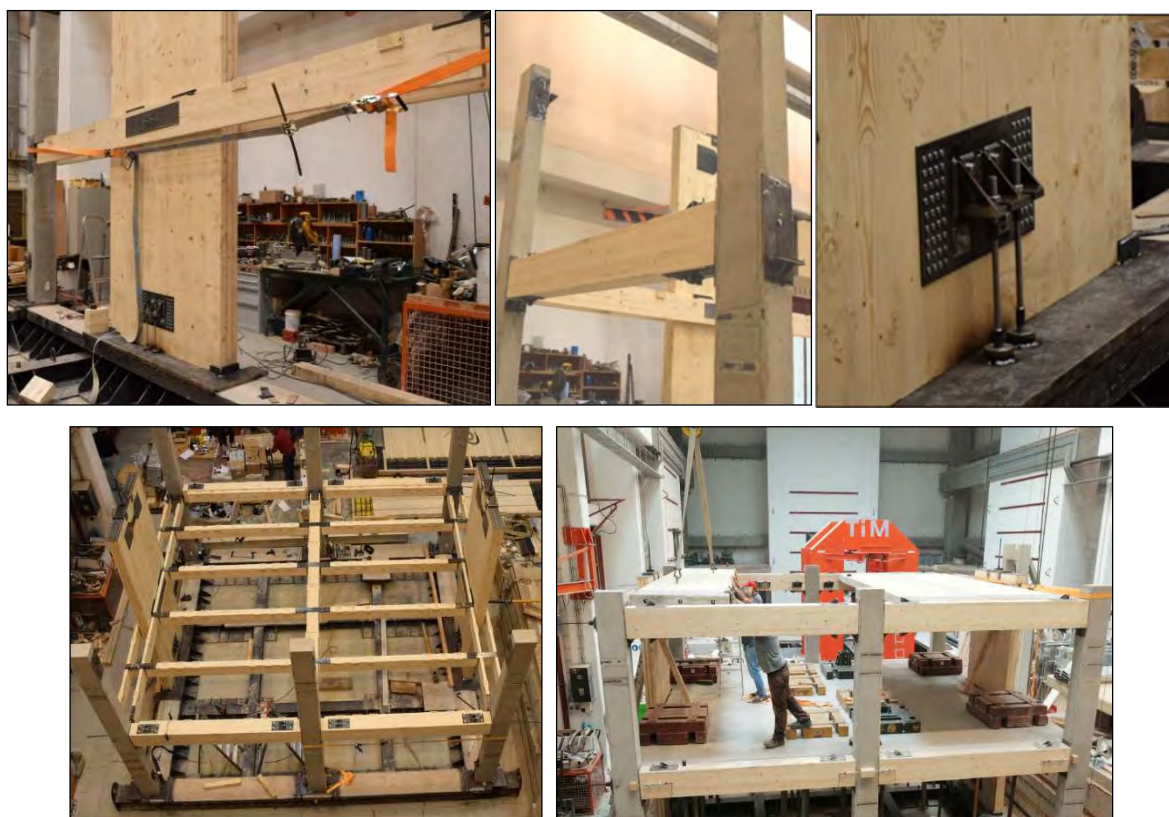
Construction of the Test specimen – assembly of the lateral beams to the wall (top, left), lifting and positioning of the seismic beams (top, centre), detail of the wall dissipaters (top, right), assembly of the timber joists on the first floor (bottom, left), assembly of the 3PT flooring system (top, right)
